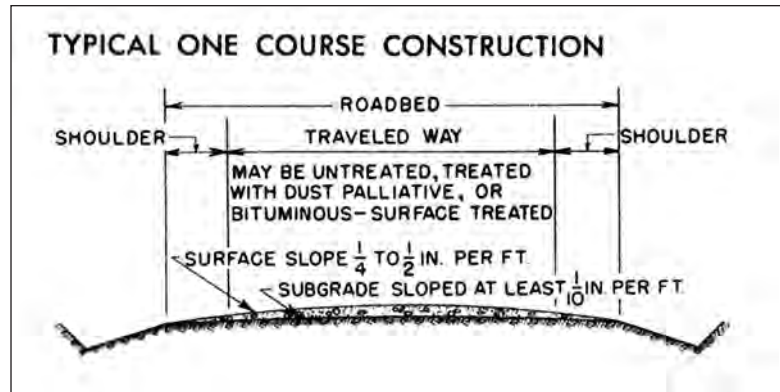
Typical cross section of a one course road. From War Department 1947:133.
